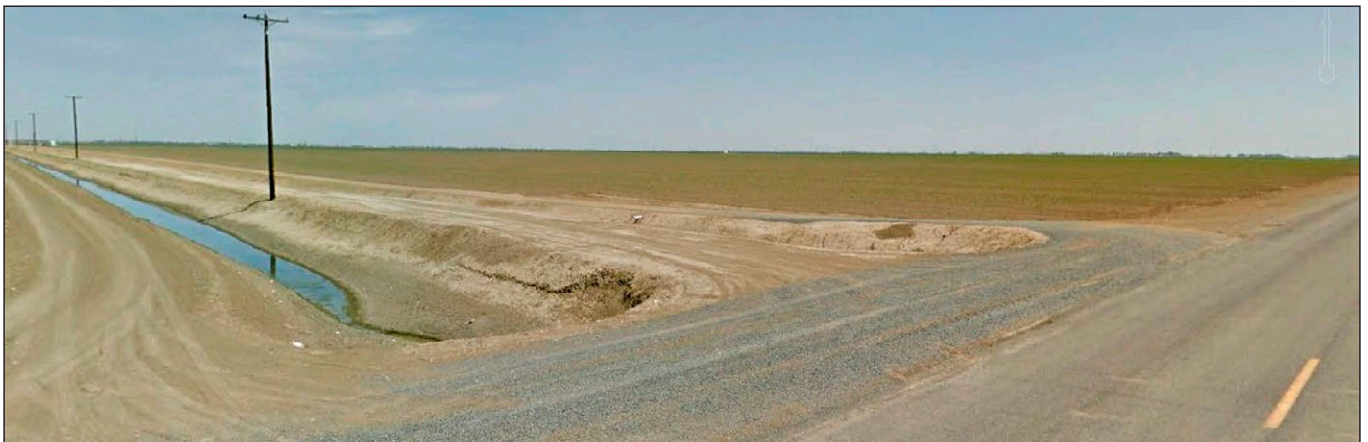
Northeastward view from southwest corner of site at Laurel Avenue.
